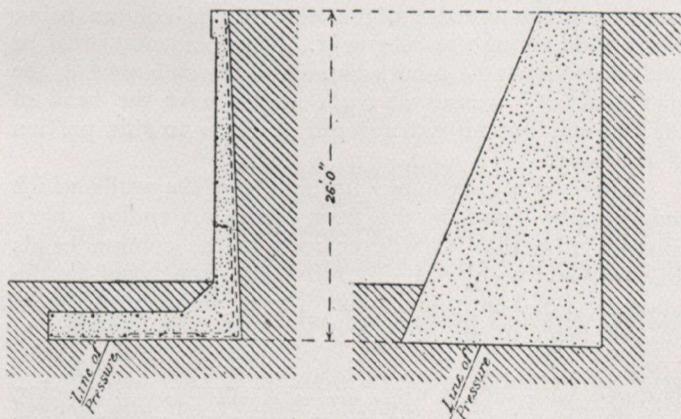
Comparison between Amount of Material required and useful space occupied in Mass Concrete and Reinforced Concrete Dock or Retaining Walls.
